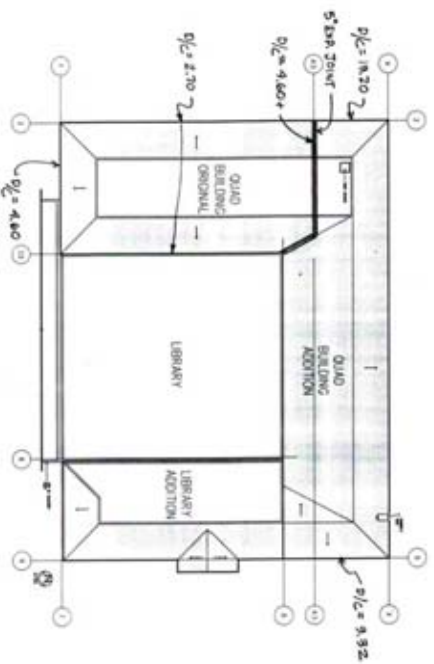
Roof plan of the Quad building showing demand to capacity ratios (D/C) for the roof diaphragms.
